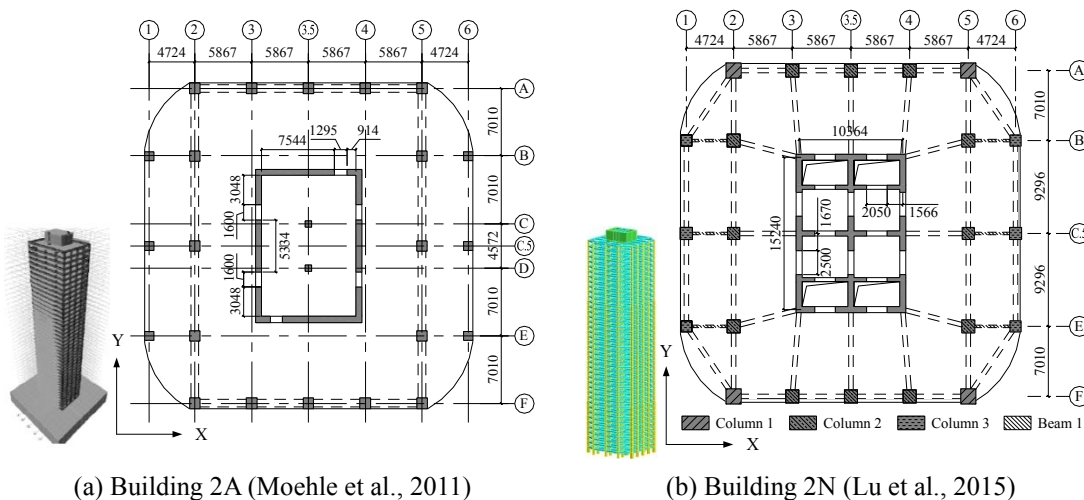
Three dimensional views and typical floor plans of Buildings 2A and 2N (unit: mm)
